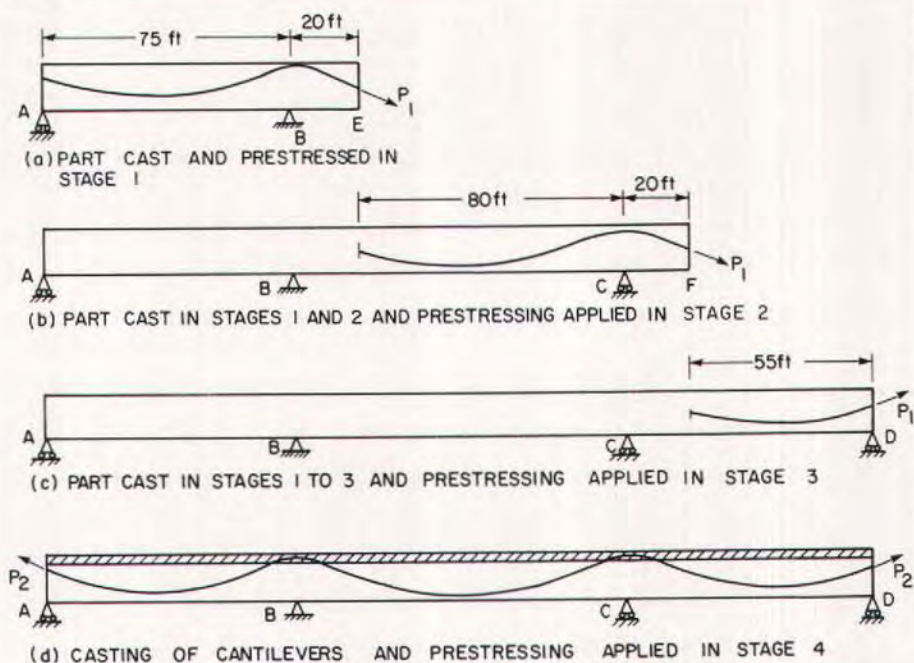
Construction and prestressing stages of the bridge of Example 2.
